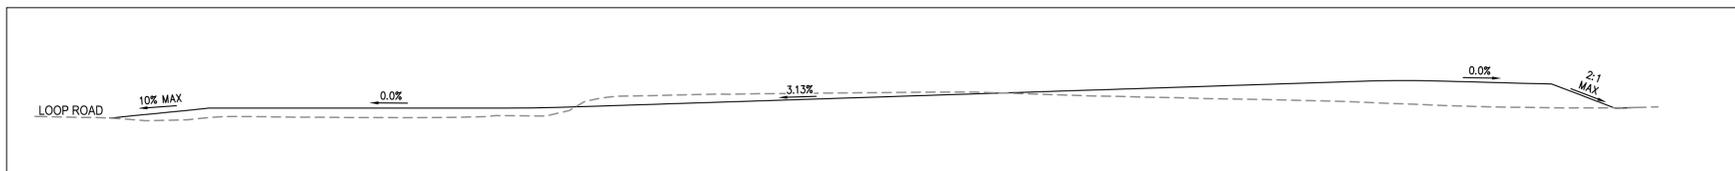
EXHIBIT KIRKWOOD REPLACEMENT PARKING LAYOUT
